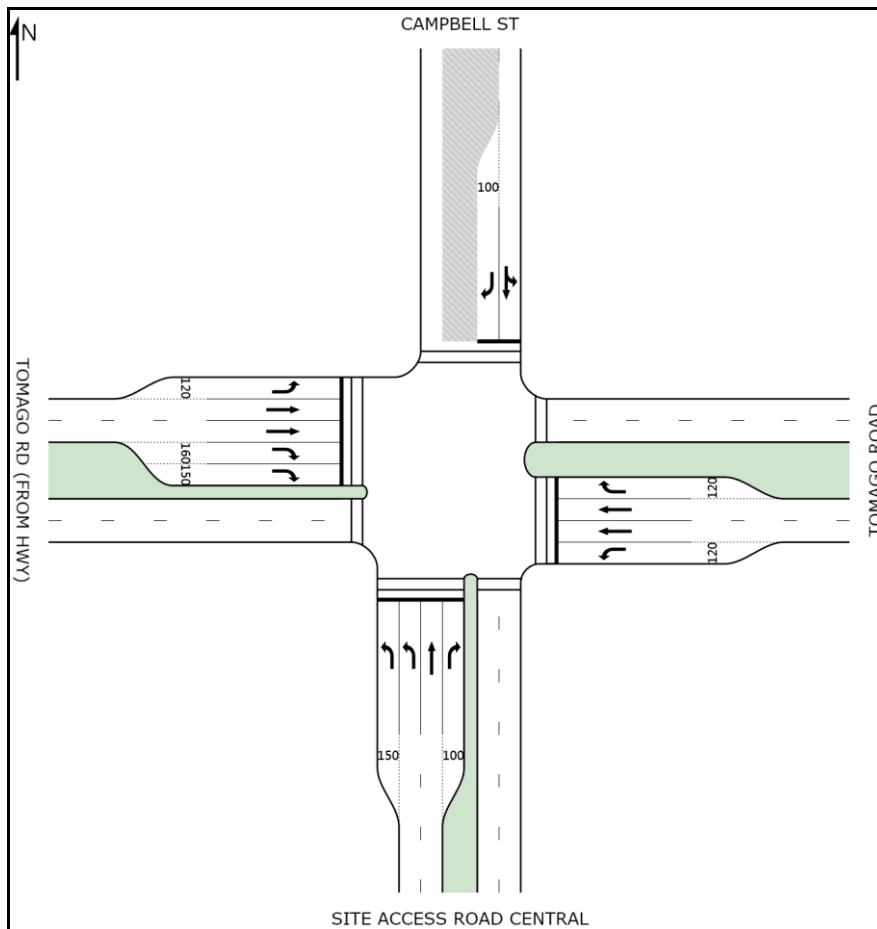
REVISED CENTRAL INTERSECTION GEOMETRIC LAYOUT
